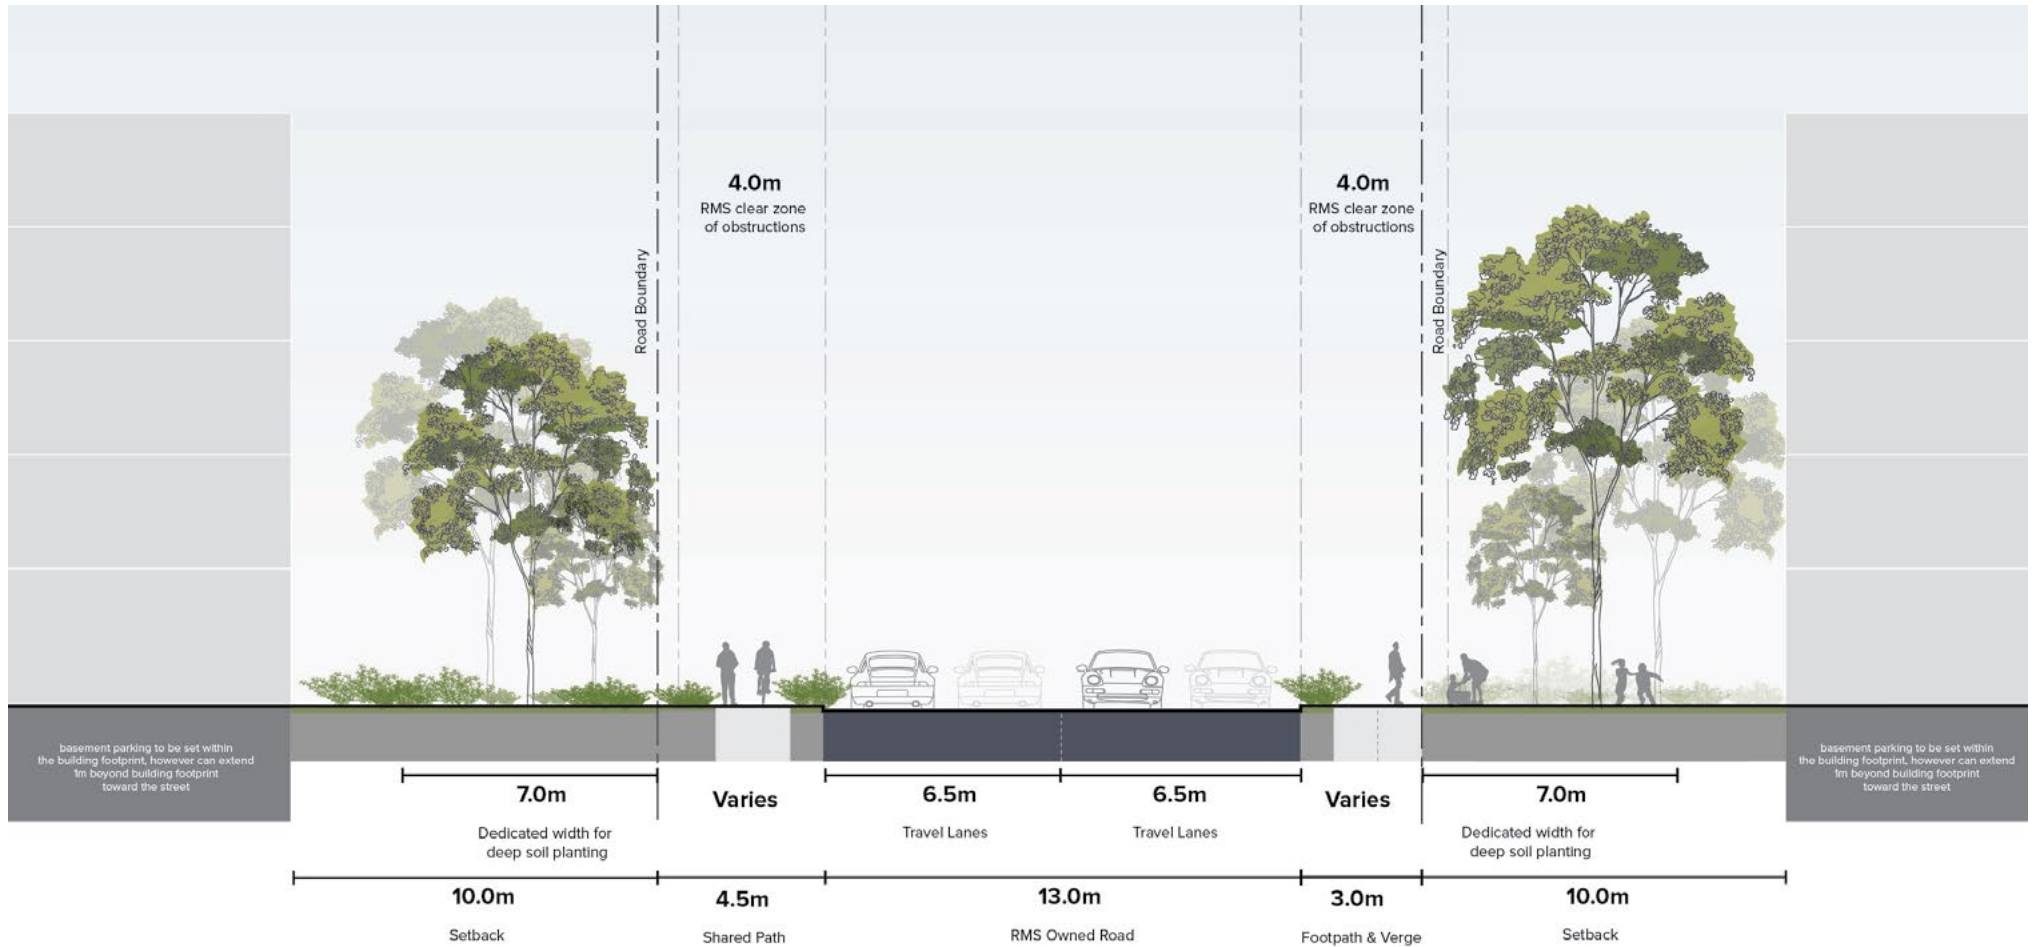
Busy road indicative street section - Castle Hill Road. Credit: Hatch RobertsDay.
